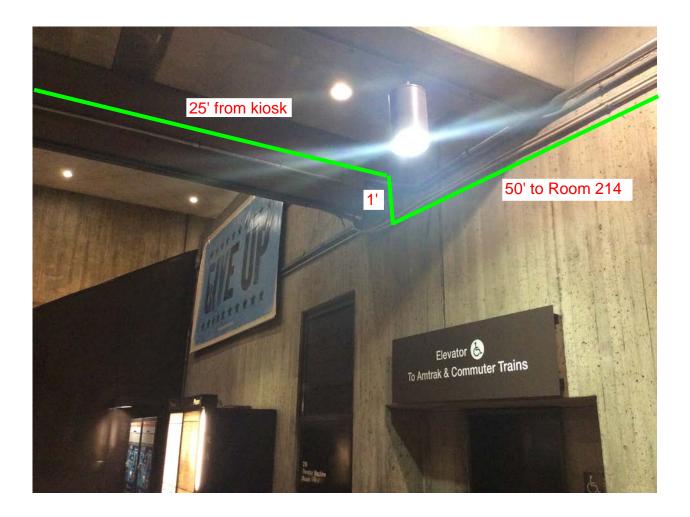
Proposed conduit run along adajcent wall to Mechanical Room 214
